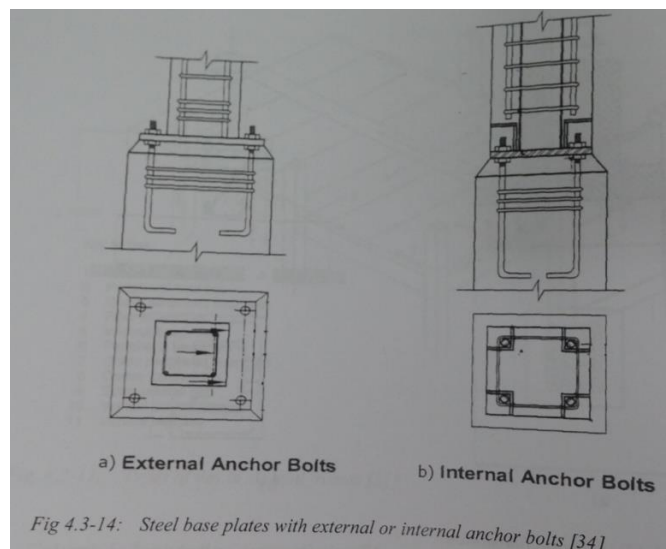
Steel base plates with external or internal anchor bolts [34]
